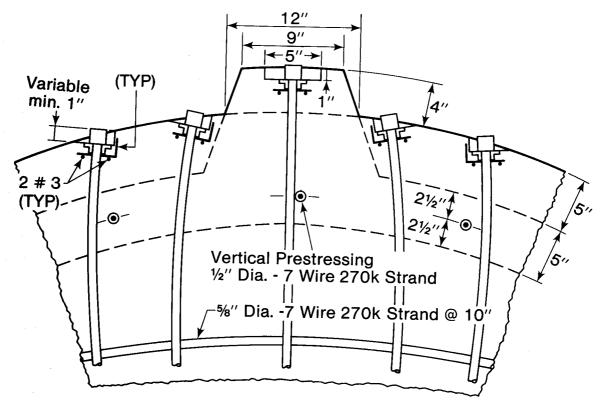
Dome Reinforcement Prior to Placing Concrete
